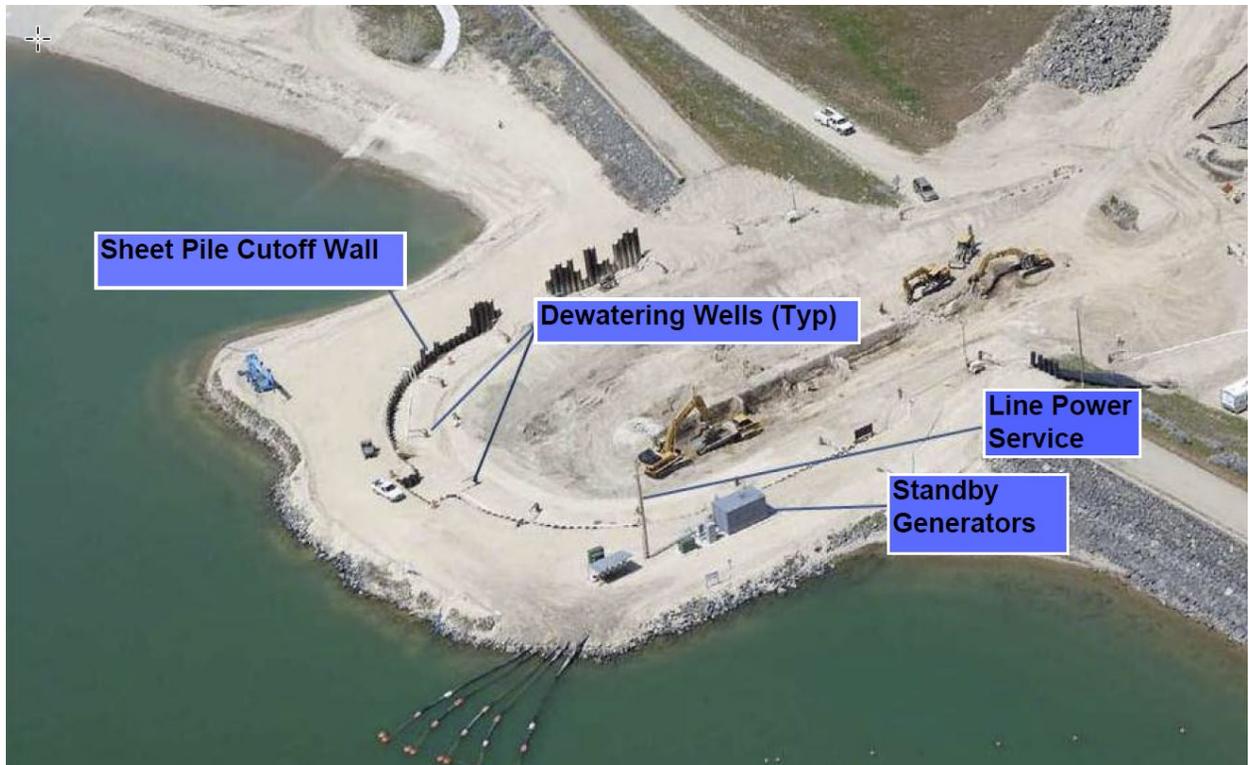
Aerial view of excavation for replacement outlet works for Deer Flat Dam, Boise, ID (Courtesy of Reclamation Project Files)
